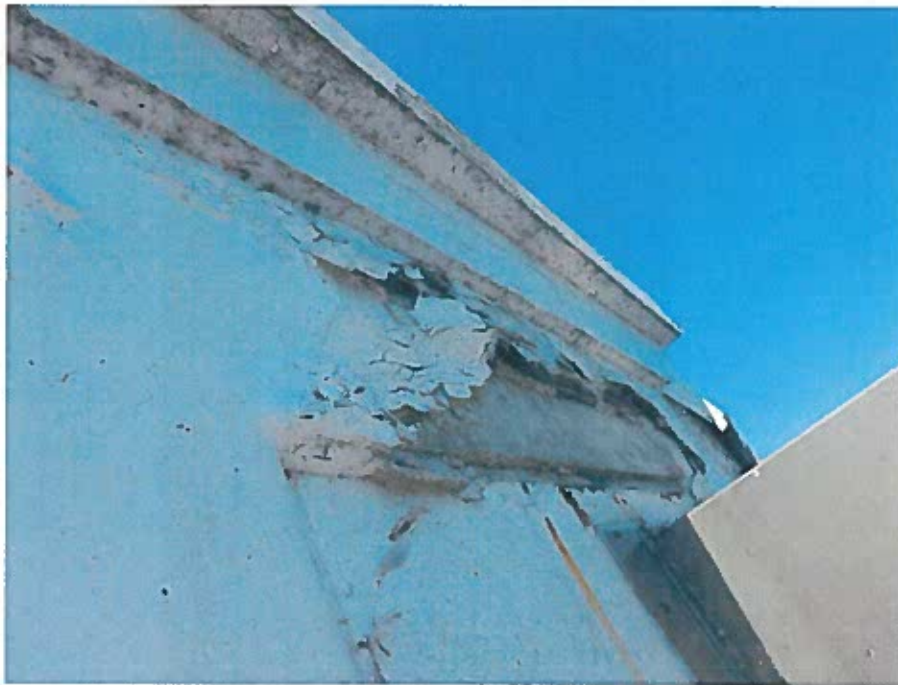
Northeast Wall – Typical Spalling of Façade
